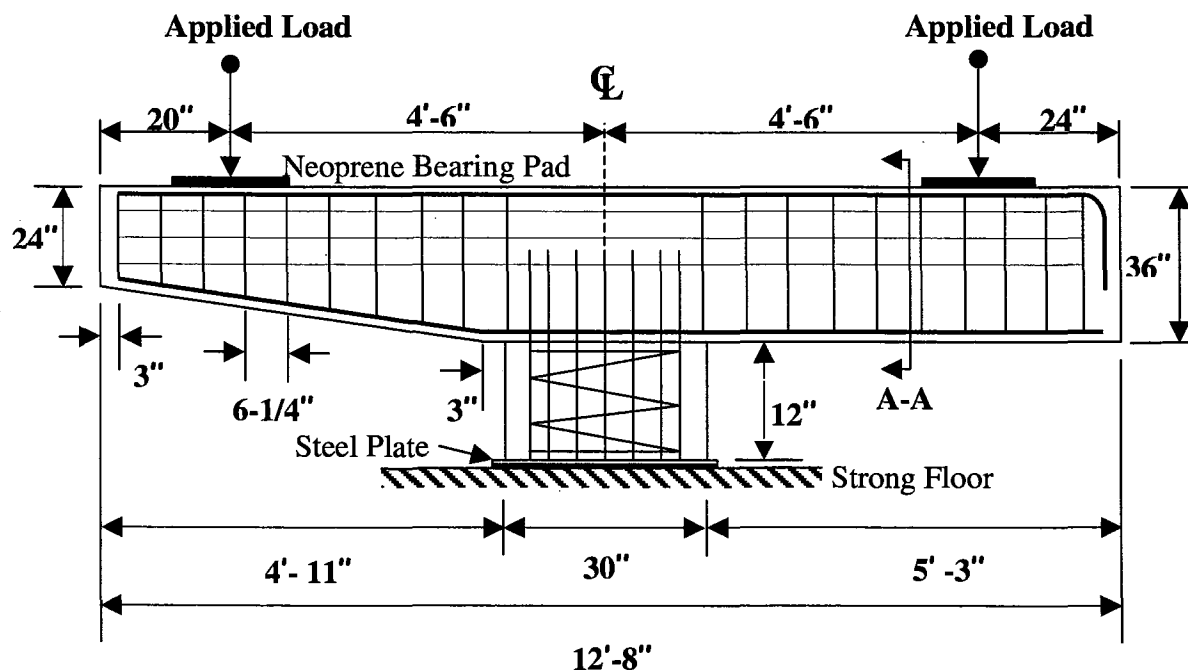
Typical Bent Cap Specimen Reinforcement Details.
